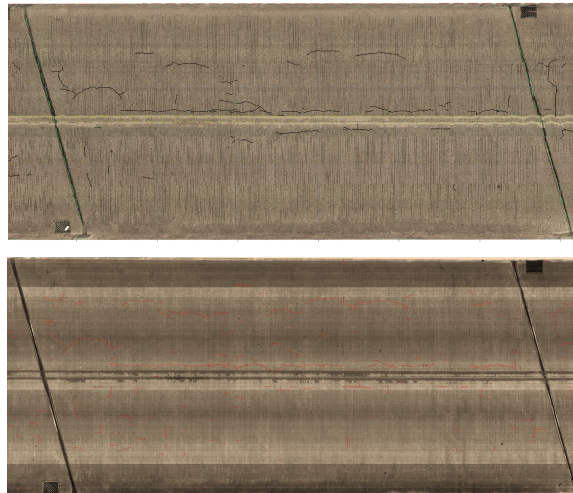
Existing Cracks of Bridge Deck No. 22387- Span 2
